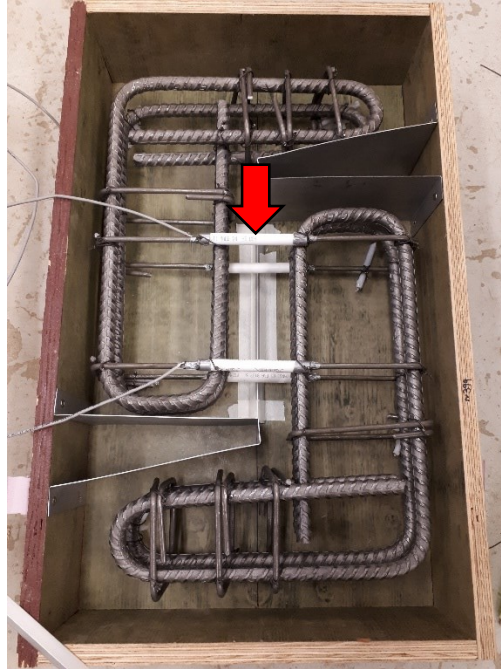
Reinforcement cage with PVC tubes installed on the legs of the stirrups
